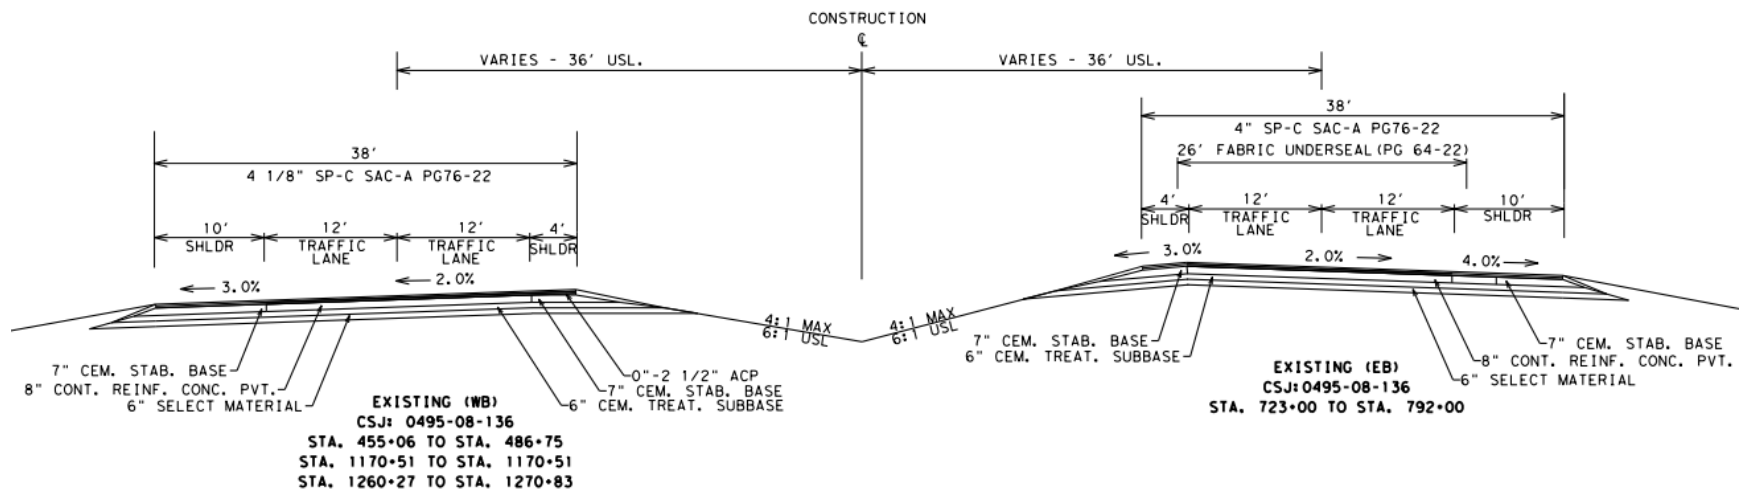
IH 20 Typical Section (taken from CSJ 0495-08-136).
